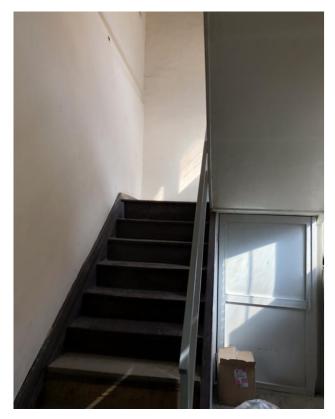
54. Steel stairs accessing to the mezzanine floor on the outbuilding structure in the west
